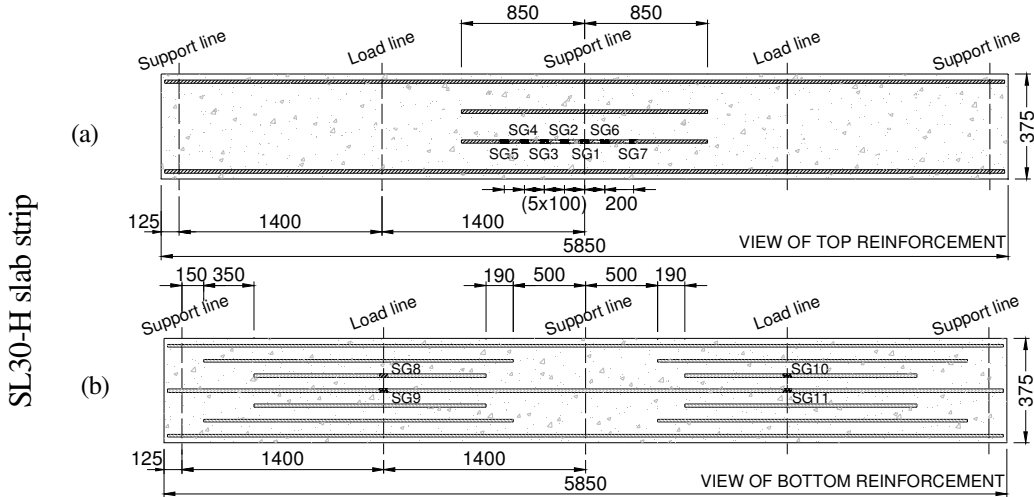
Arrangement of the (a-b) longitudinal steel of the SL30-H slab strip.
